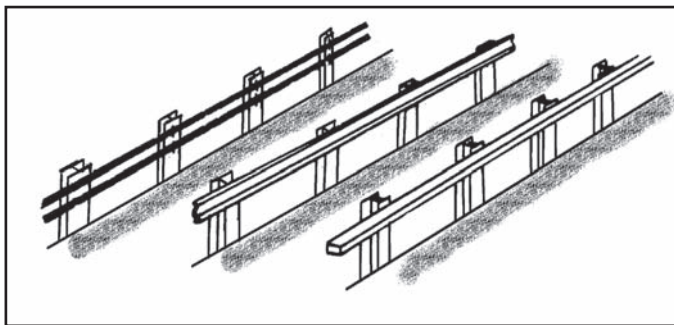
Typical Guardrail Construction (UFC 4-022-02)
